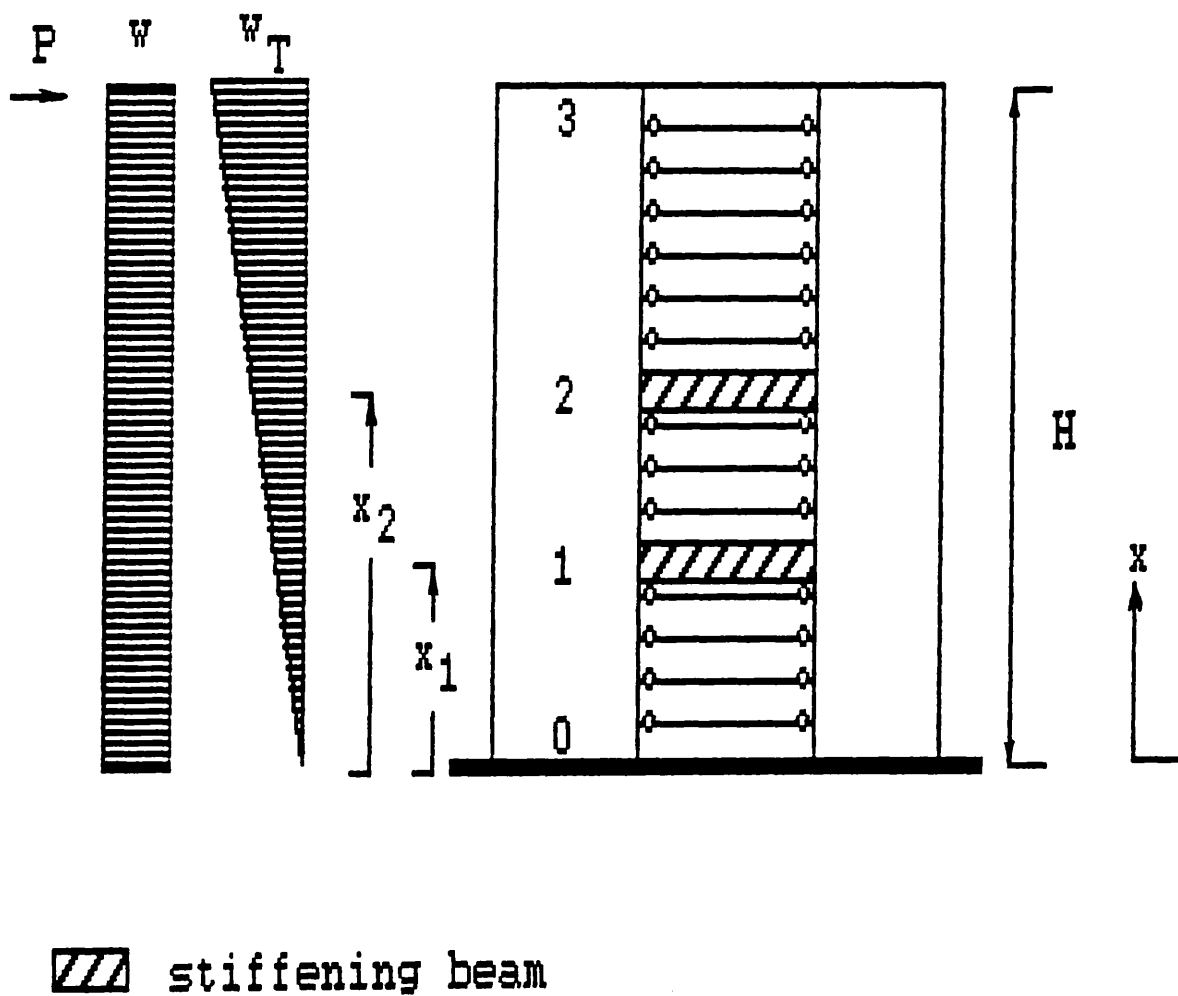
A LINKED SHEAR WALL STRUCTURE WITH TWO INTERMEDIATE STIFFENING BEAMS
